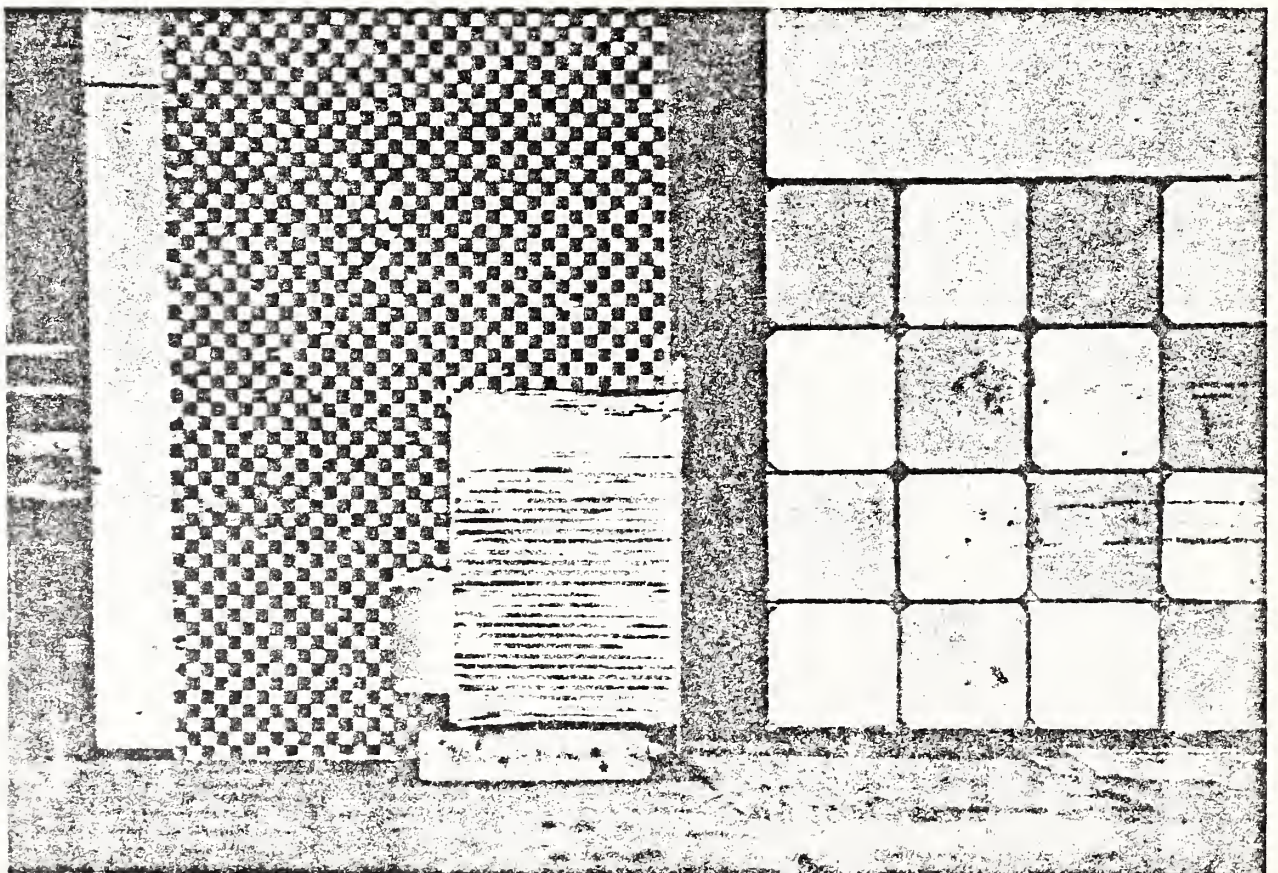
PRE-TEST MDB FACE - VIEW 2
